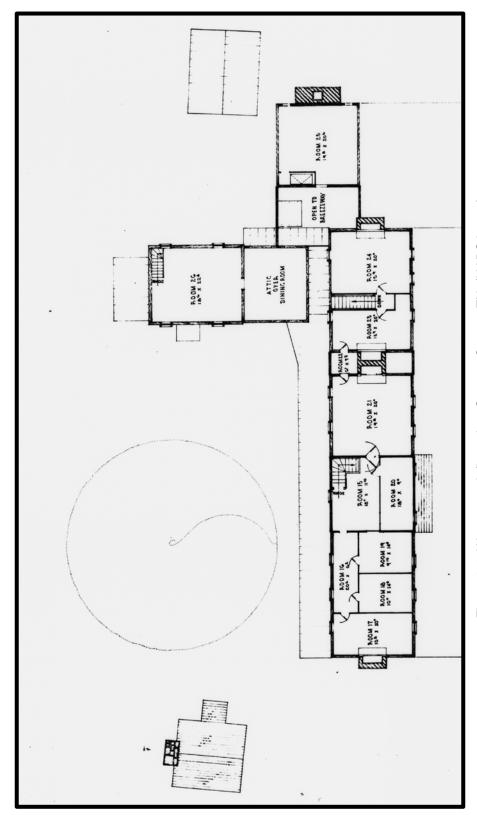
Wynnewood, floor plan, Sumner County, TN. (HABS image)
